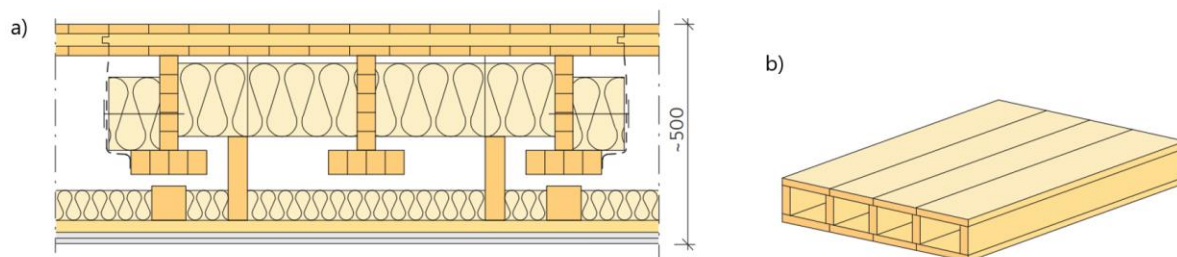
a) A cassette slab with a suspended ceiling, which is made with a CLT slab reinforced by web joists and flanges. b) A hollow core slab. The figures are used with permission from Swedish Wood (2019) and are taken from the CLT Handbook.
